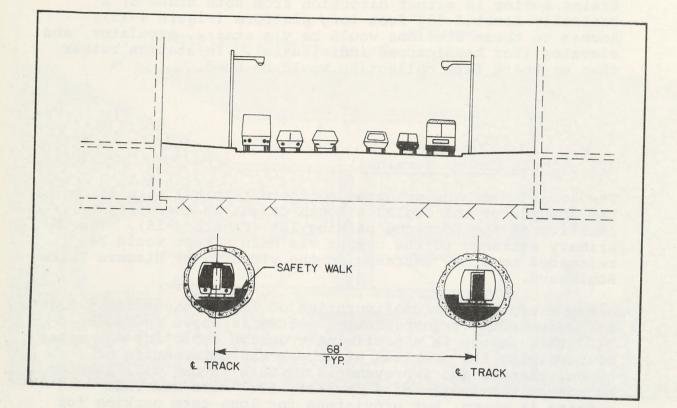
Rock Tunnel Section Configuration to provide tail track space beyond the South Campus Station. A double crossover would be provided at this station so that trains could switch from the north-bound track to the southbound track.
